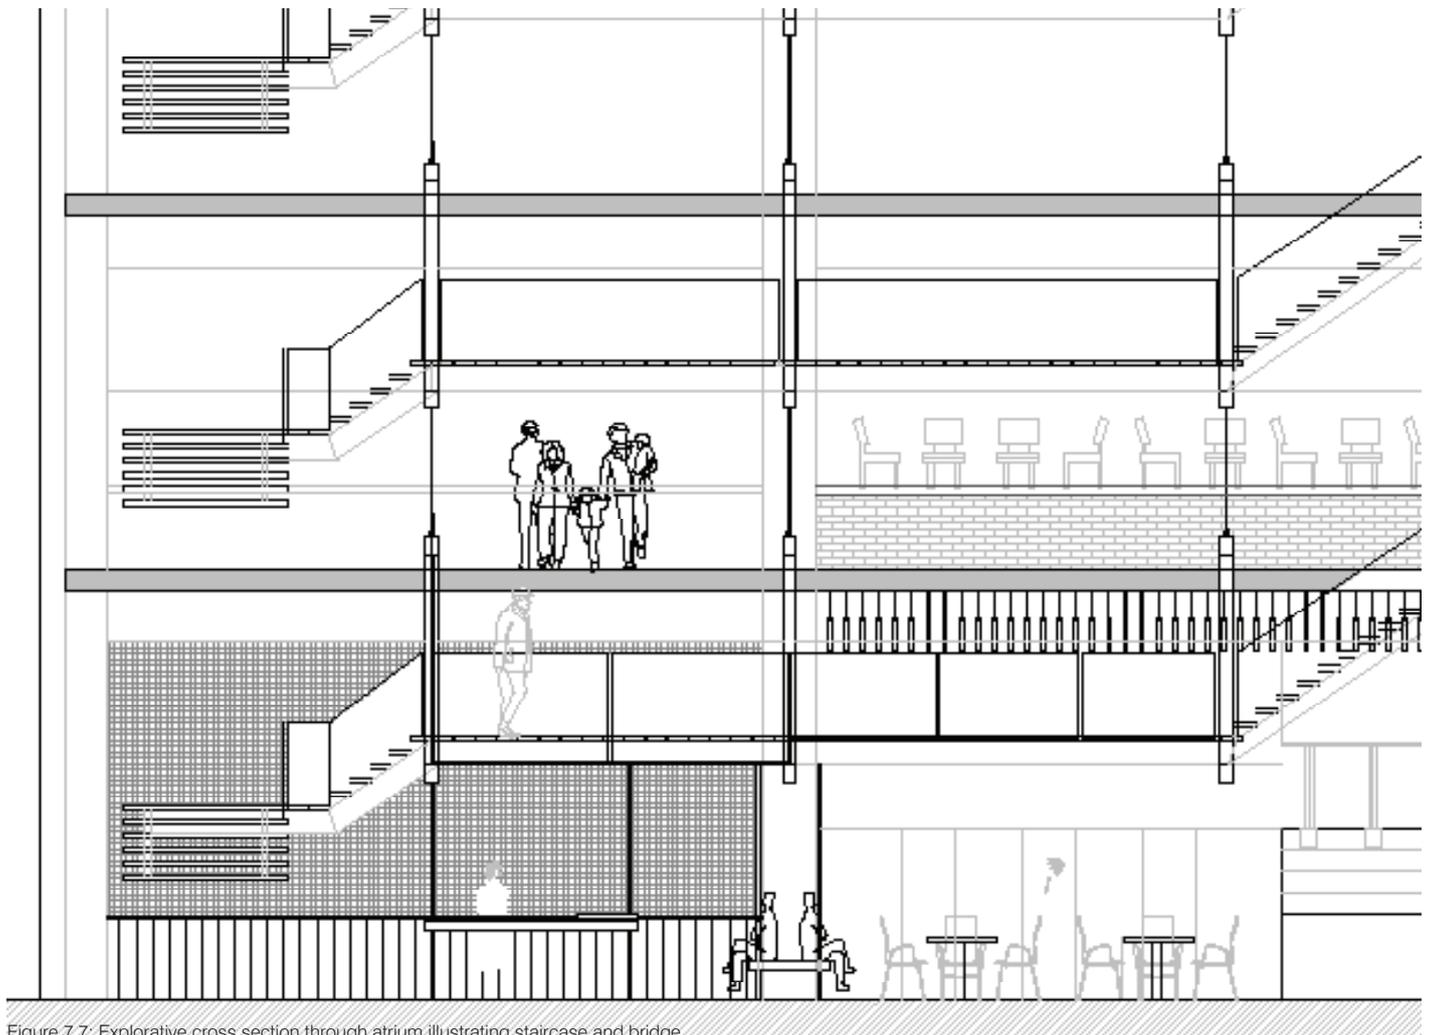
Explorative cross section through atrium illustrating staircase and bridge construction- not to scale (Author, 2011).
